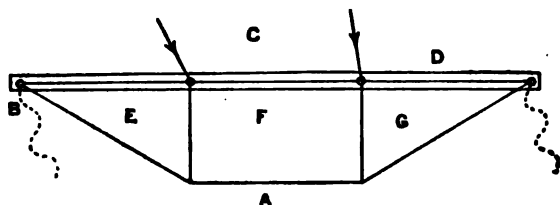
FRAME DIAGRAM FOR A TRAPEZOIDAL TRUSS.
